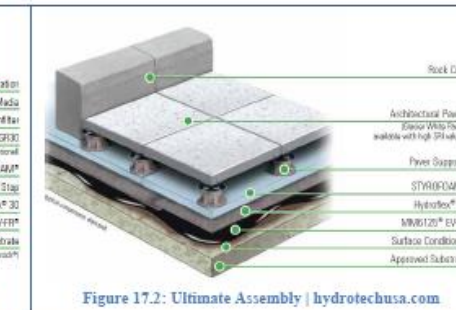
Ultimate Assembly | hydrotechusa.com
